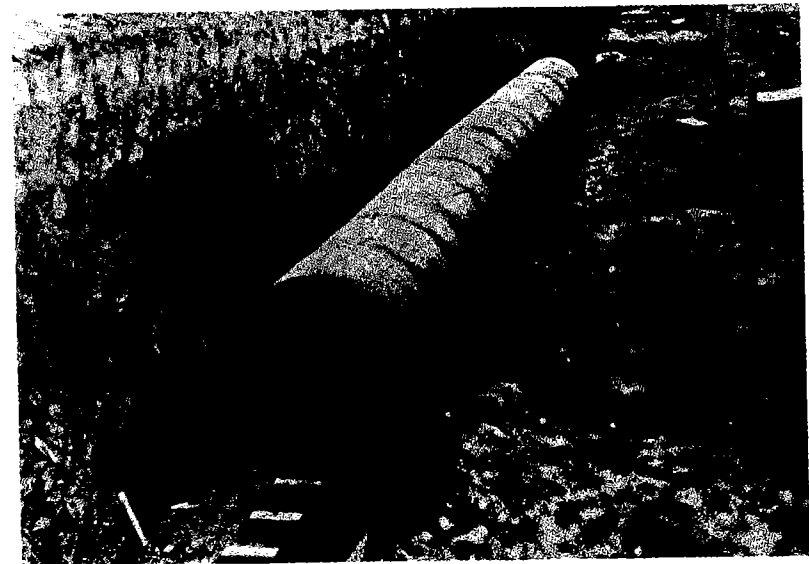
Sewer of reinforced concrete pipes shown in Fig. 17
